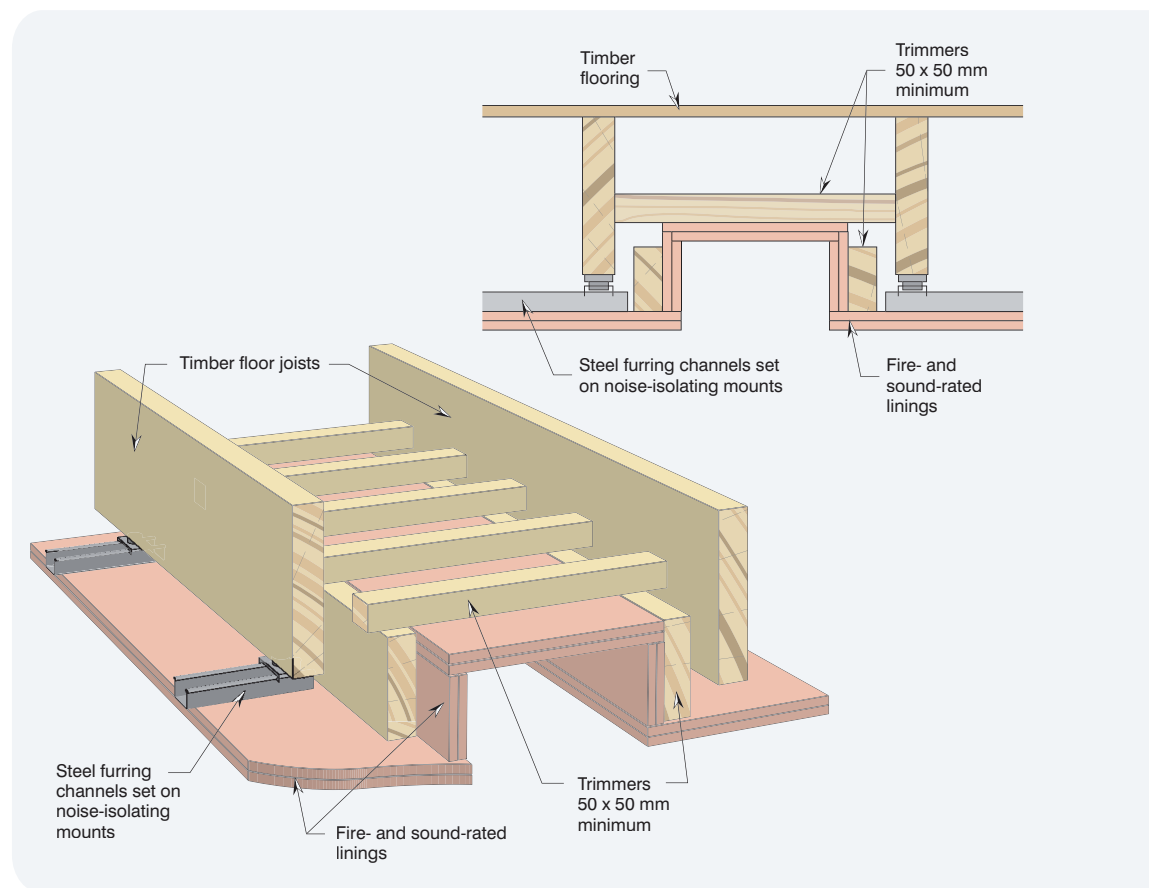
Framing details for recessed light in fire-rated floor/ceiling.
